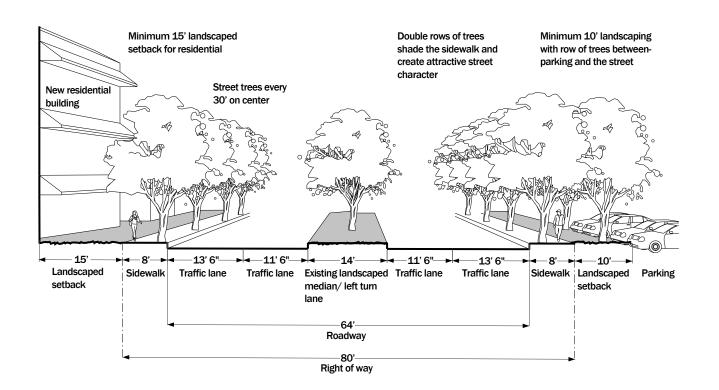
Downtown Retail South: Main Street Enhancements
